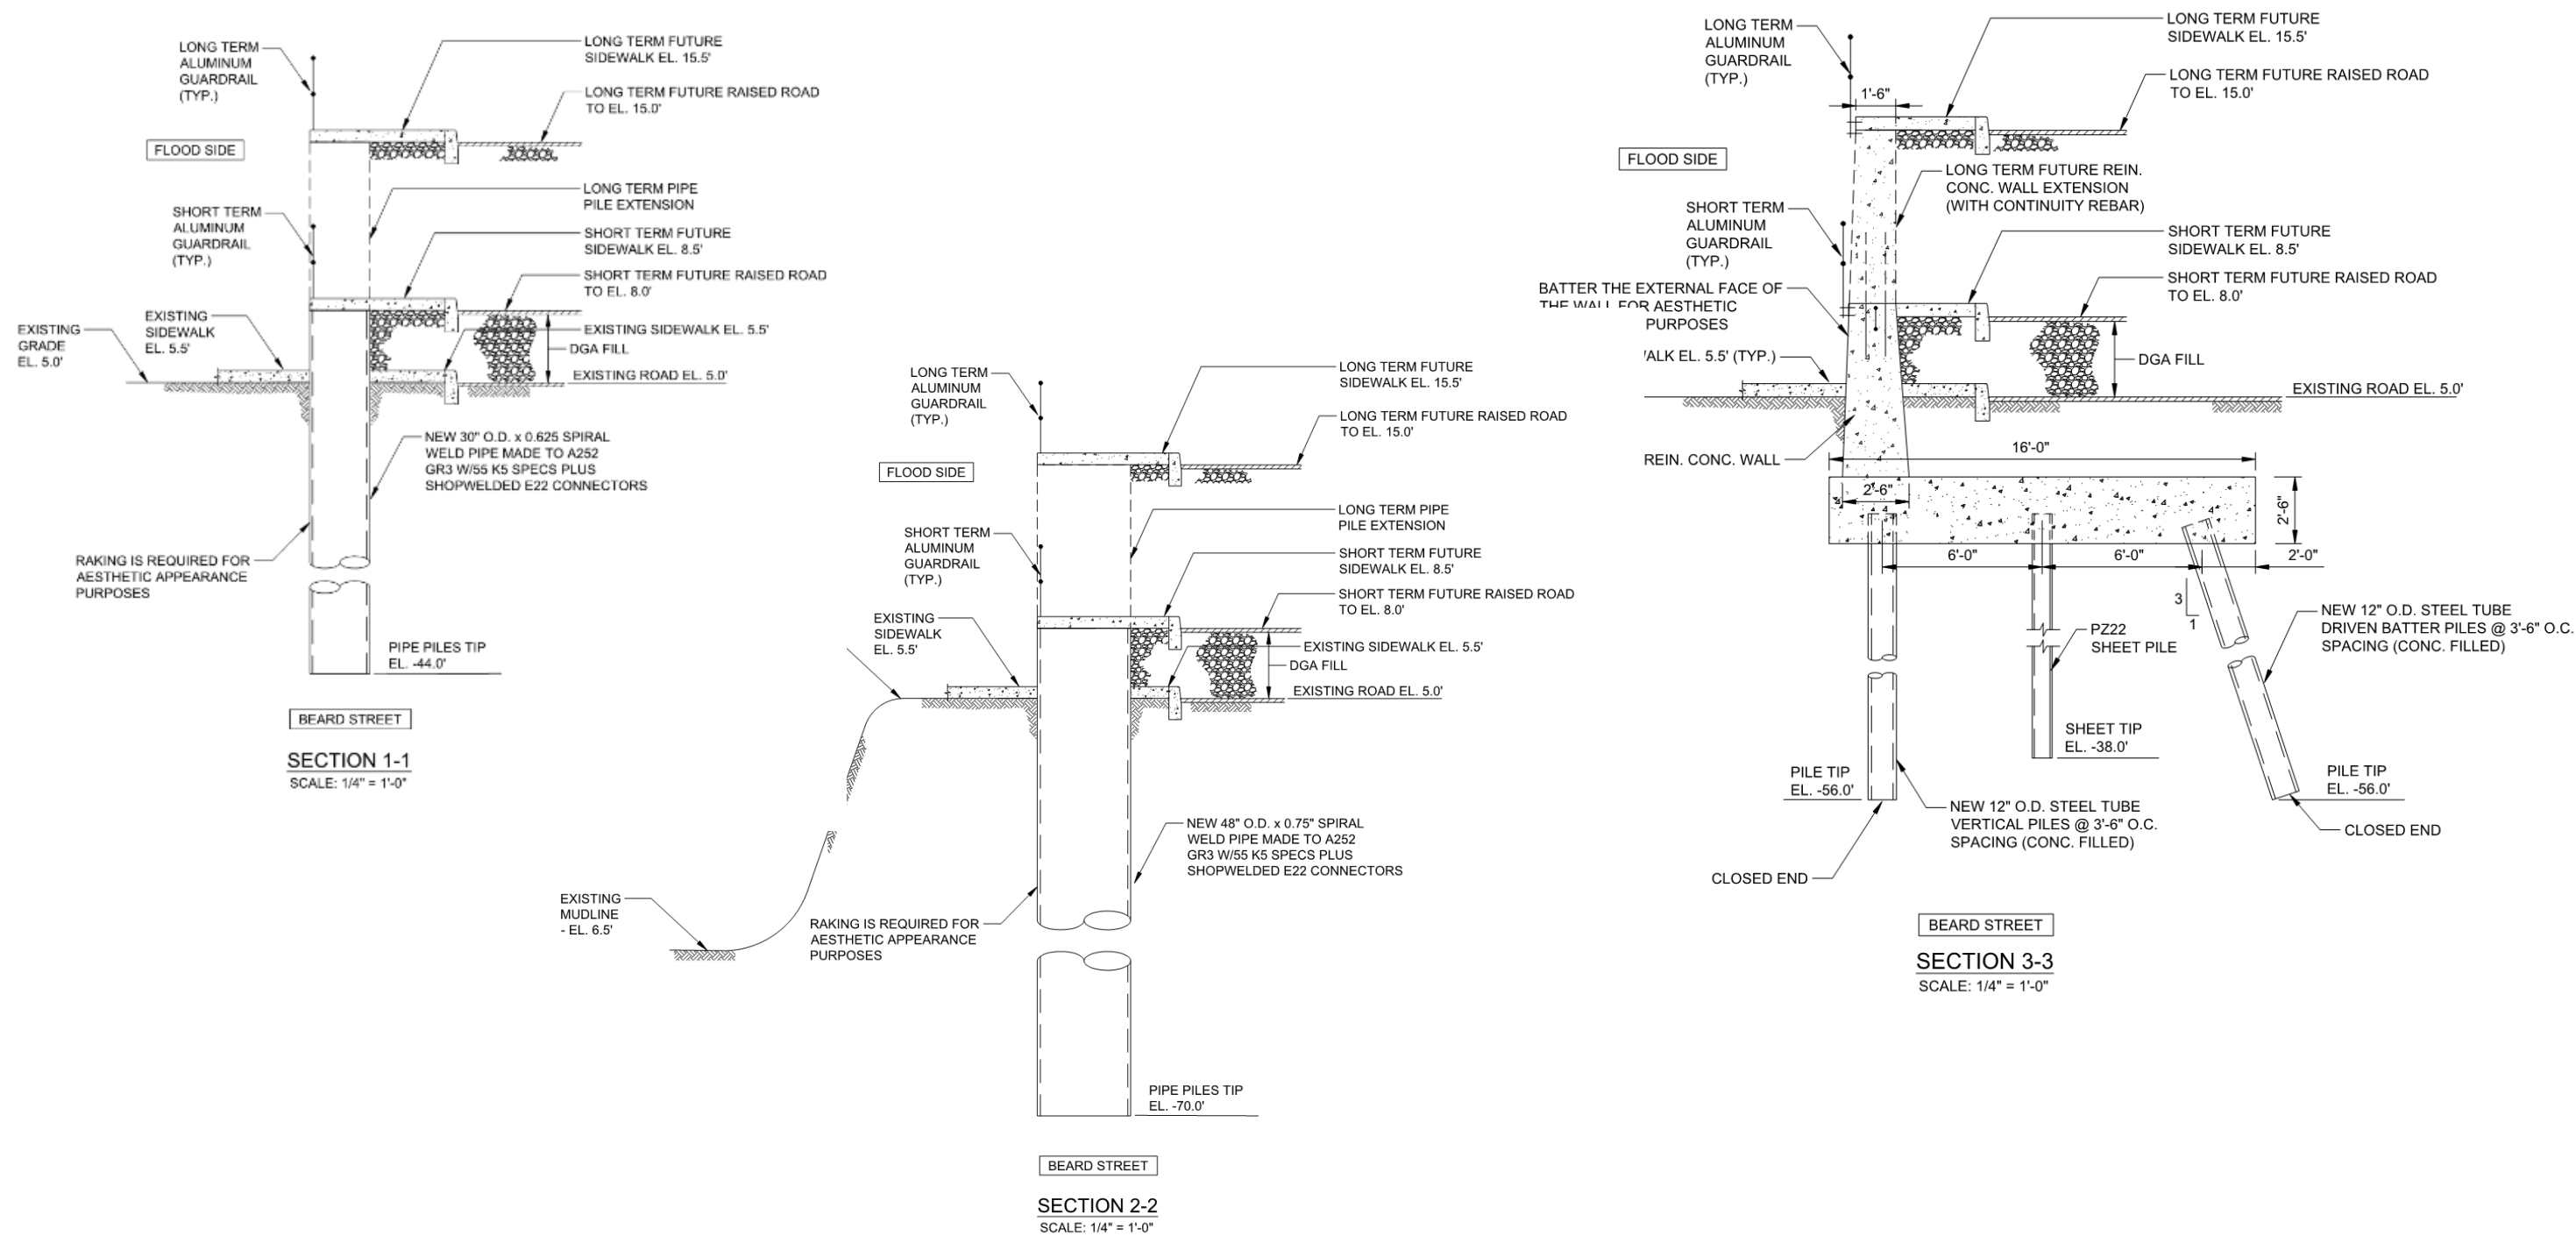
Typical Conceptual Sections (1-1, 2-2, 3-3) of Beard Street's Future Adaptable Floodwall
